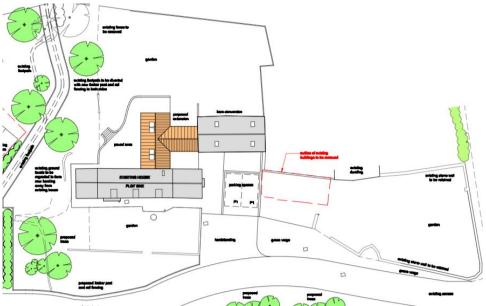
Approved Site Plan under 17/01330/FUL (amended by 20/00536/FUL)
